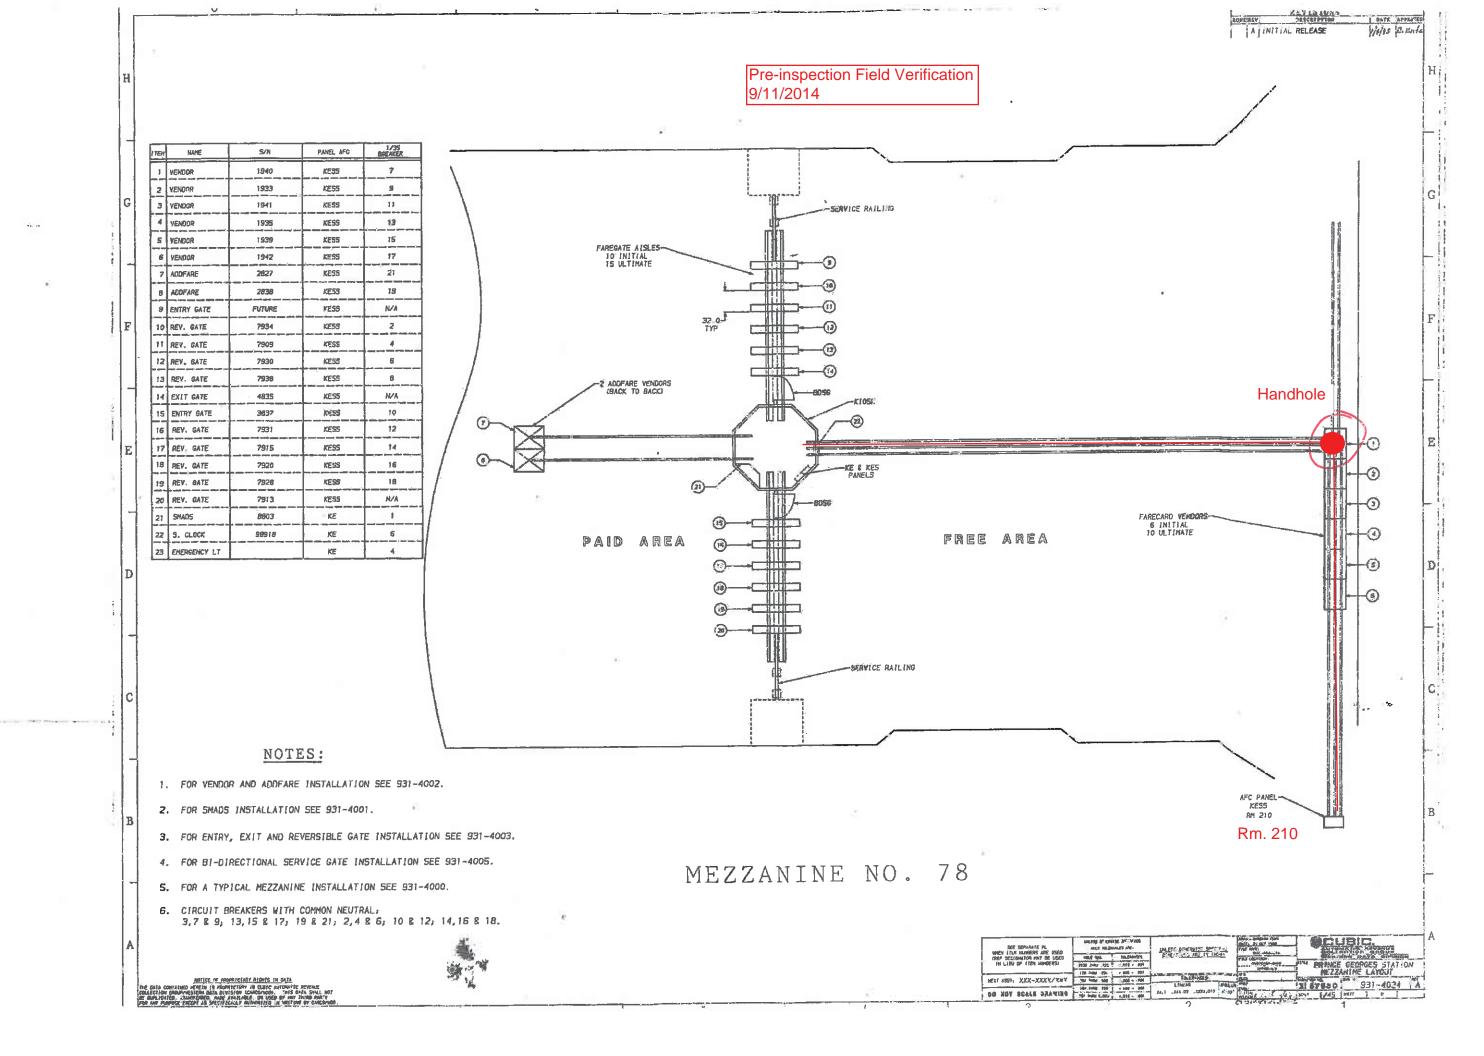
E08 Prince George's Plaza – Panel KESS in room 210
